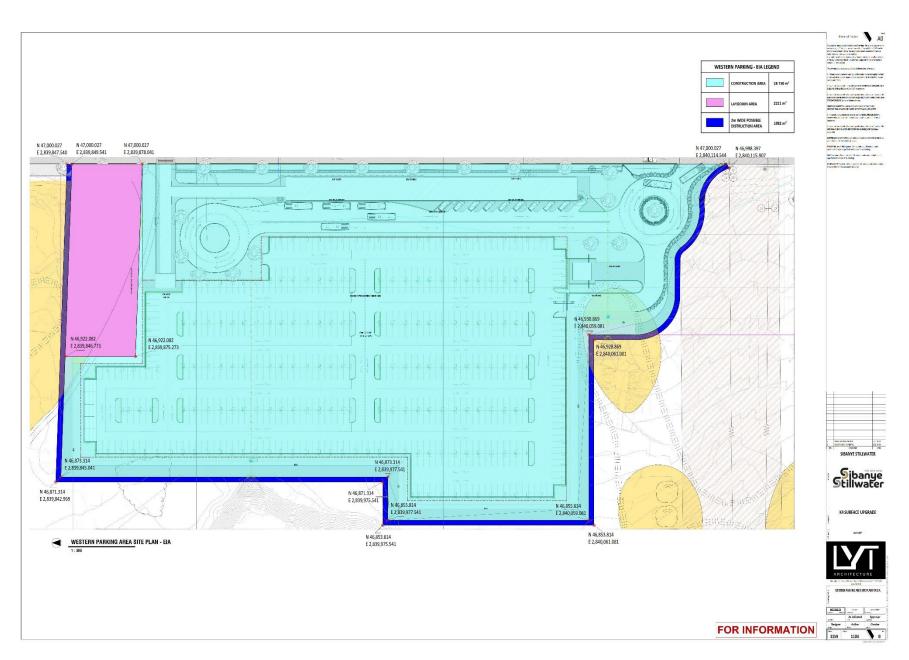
1 Layout of proposed new parking area at K4 Shaft
